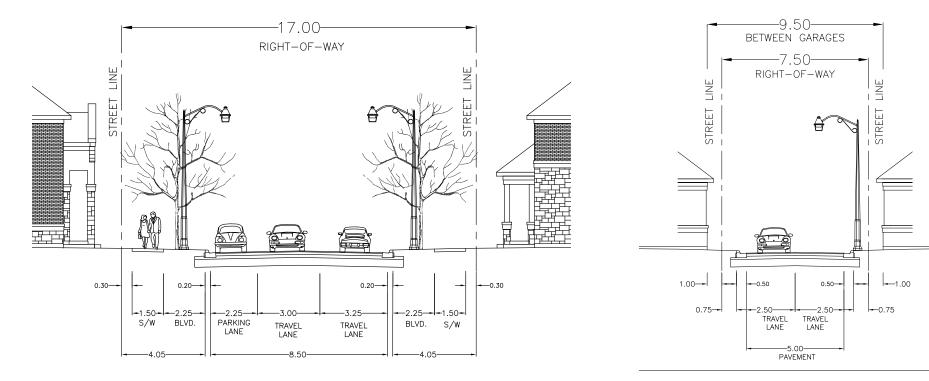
Local Road - 17.0m R.O.W. / 2 travel lanes / on-street parking on one side / 4.0m boulevard
